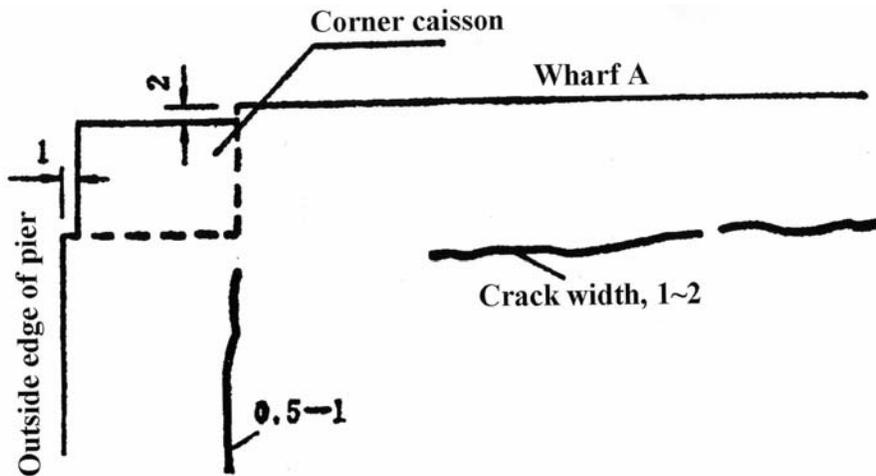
A sketched plan of cracks and dislocations at the corner of wharf A (in cm).
